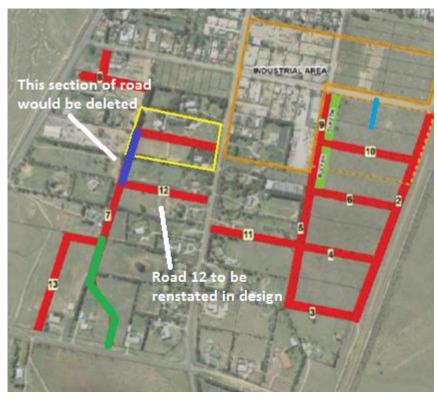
Option 2 showing extent of southward road extension which would no longer be required if cul-de-sac was implemented and reinstatement of Road 12.
